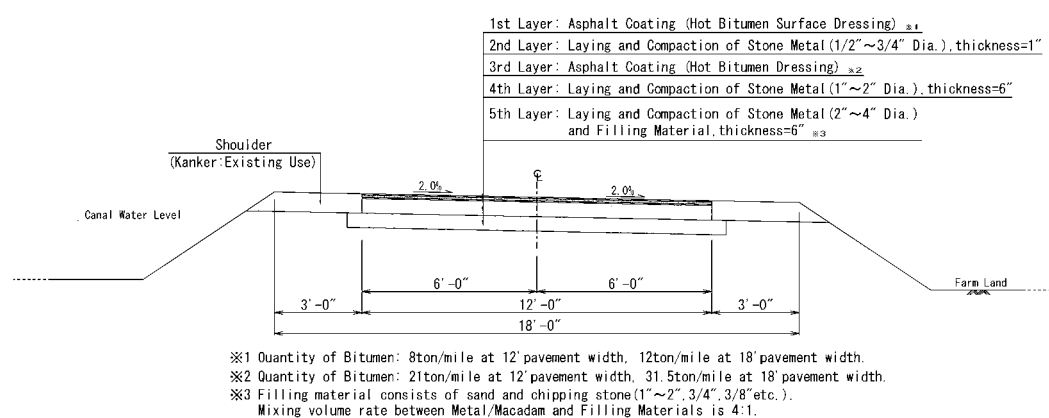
Typical Cross Section of Asphalt Pavement (Canal Inspection Road)
